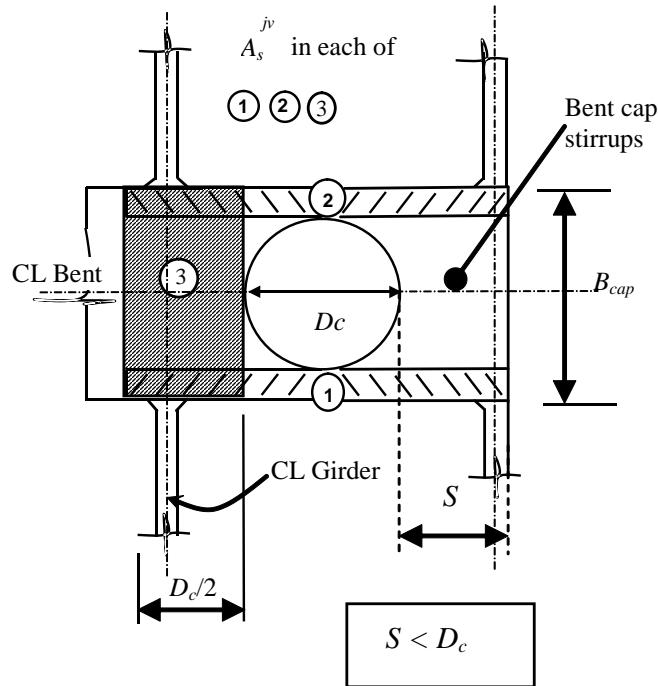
Location of Knee Joint Vertical Shear Reinforcement (Plan View)
